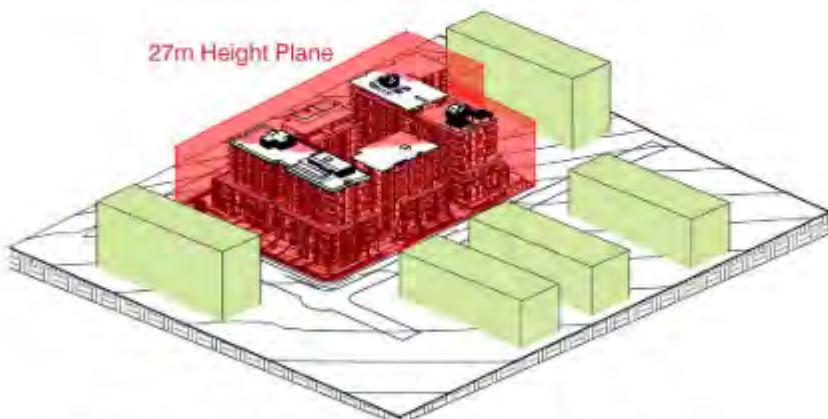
Revised Scheme Height Plane (Source: PTW Architects, 2019)
